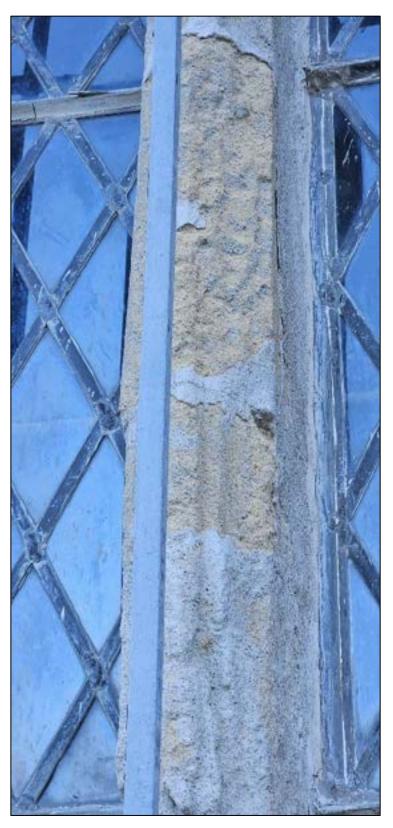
The central mullion shows alveolar, or honeycomb decay. The area is subject to extreme wetting and drying and salt crystallisation has caused spalling of the shelter coat.
